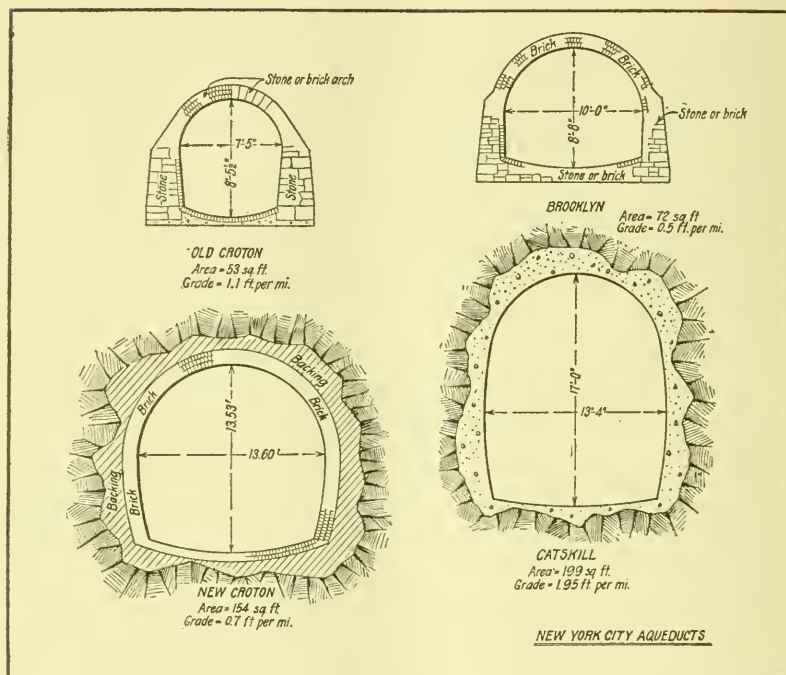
TYPICAL SECTIONS OF CROTON AQUEDUCTS.
